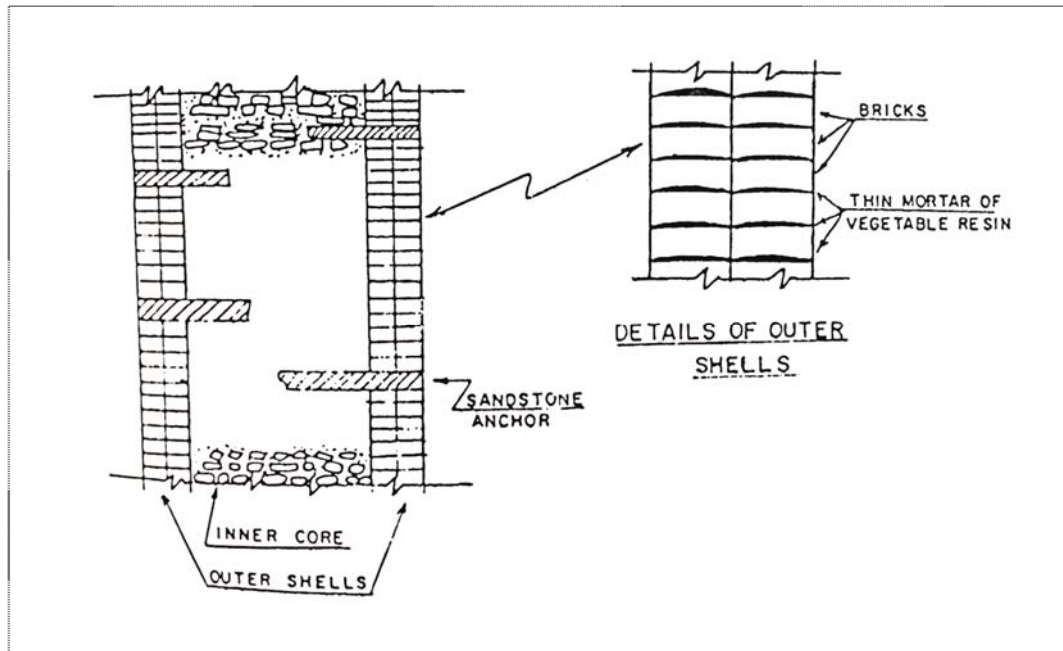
Drawing of a section of typical wall showing the difference between surface sections ("outer shells") and intermediate sections ("inner core").
